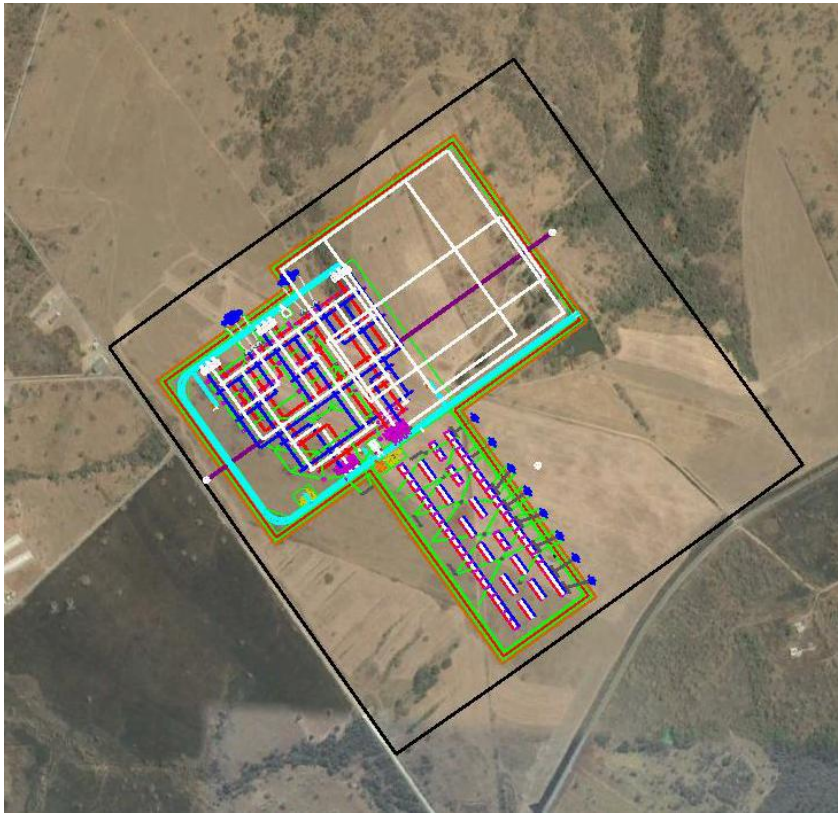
Layout 2: 400 kV yard parallel to the road and space for future lines on the north-east
